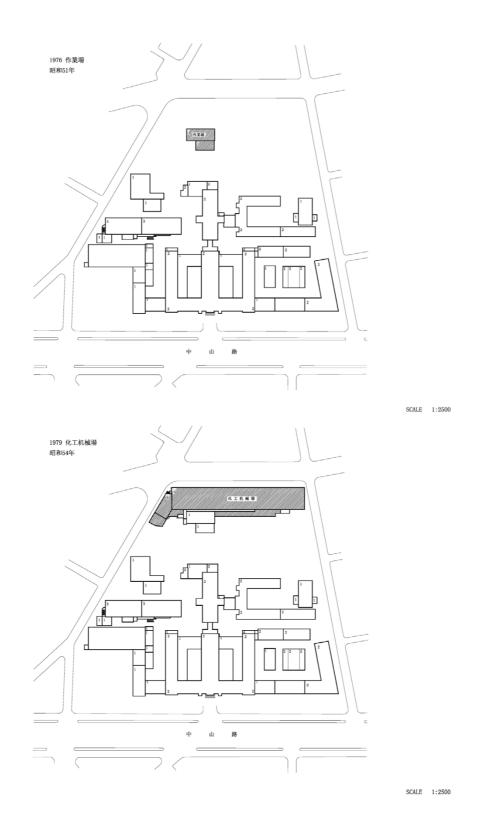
Retraced Campus Site plans of Nanyuan Campus after 1945
